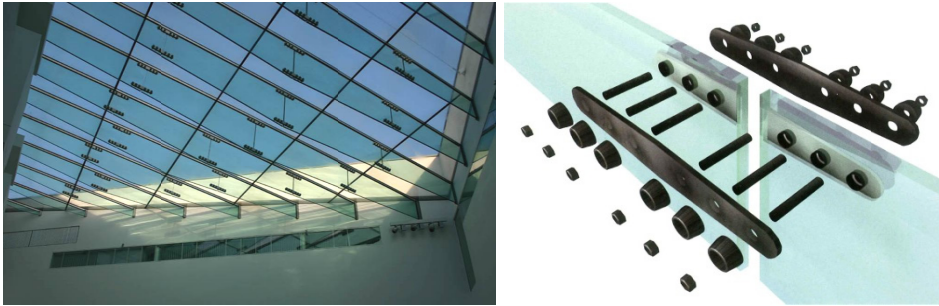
Segmented 15.5 m glass beams applied in the atrium roof of the Medical School building in Glasgow, Scotland. Engineer: Arup.
